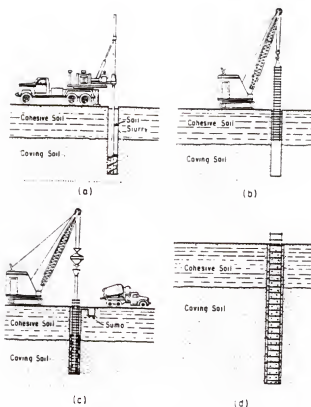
Slurry method of drilled shaft construction (a) drilling to full depth with slurry; (b) placing rebar cage; (c) placing concrete; (d) completed shaft. [From Reese 1978]
